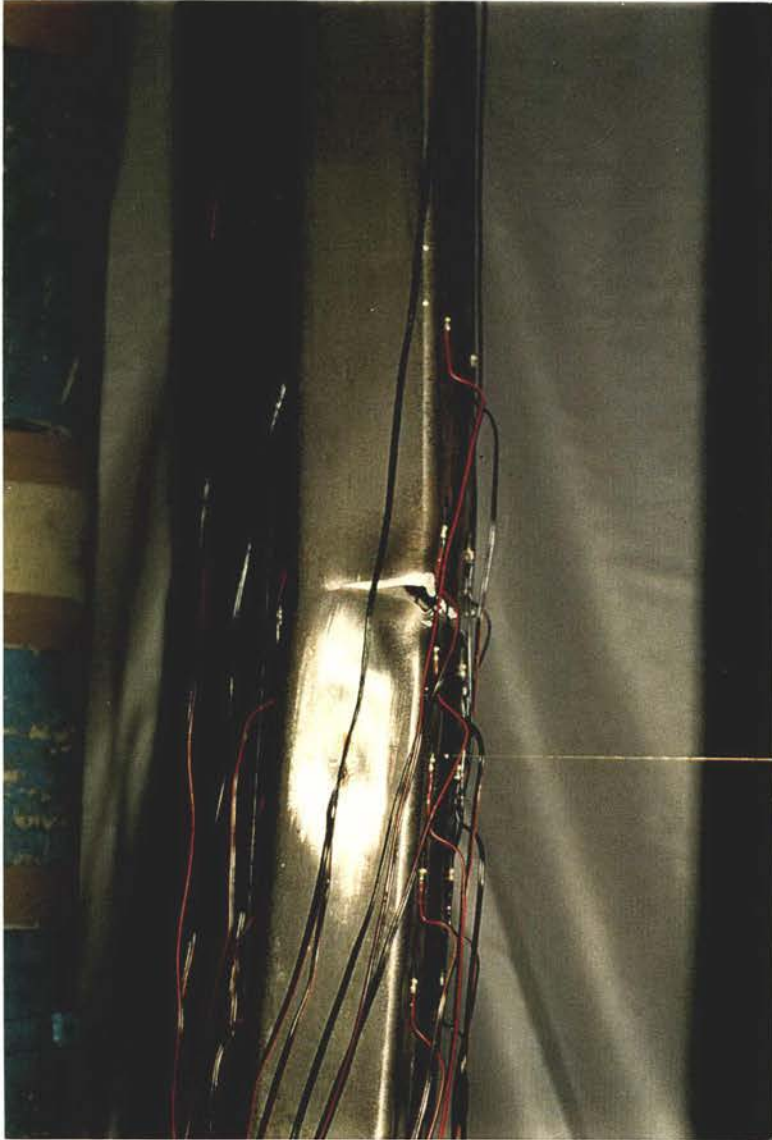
Specimen #1: view of the fracture at the end of the test.
